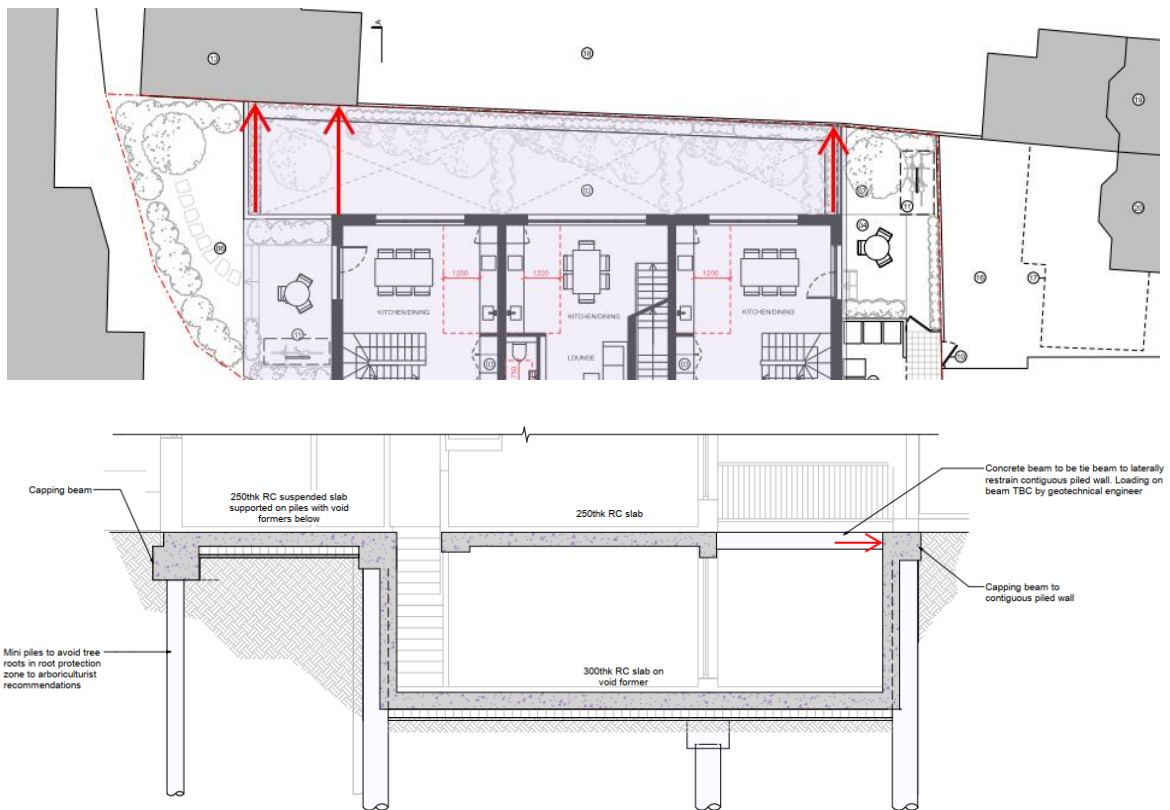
Position of Permanent Horizontal Props to Capping Beam
